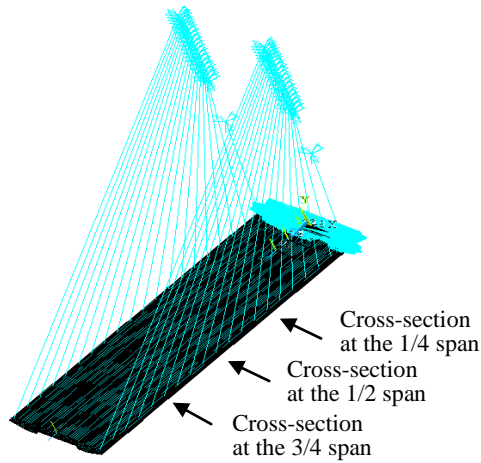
Half FE model for the construction period with a maximum cantilever girder length
